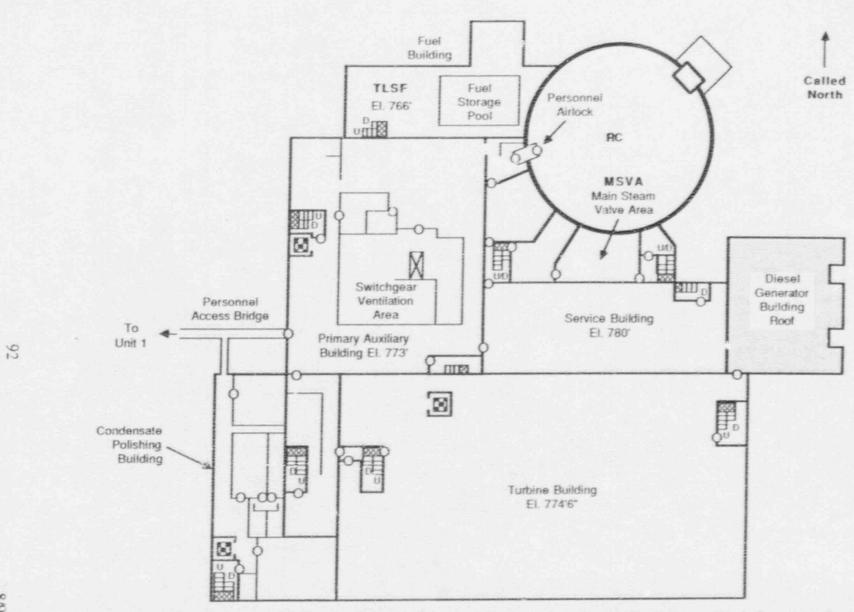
Beaver Valley 2 Reactor Containment, Primary Auxiliary Building, Rod Control Building, Fuel Building, and Turbine Building (Elevation 774'6")
